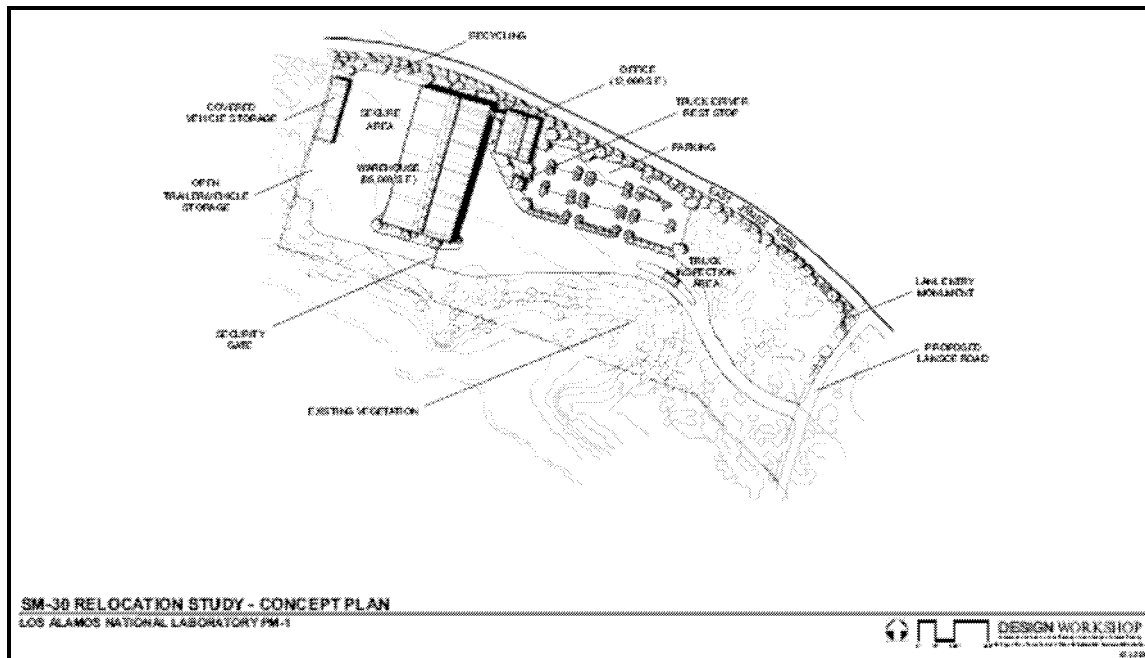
Technical Area 72 Remote Warehouse and Truck Inspection Station Conceptual Layout
